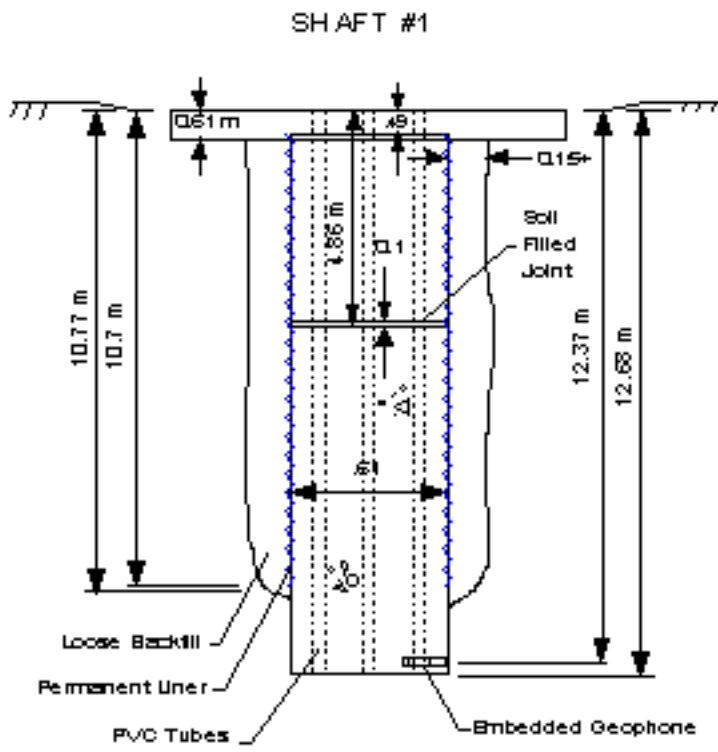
Detailed Schematic of Shaft 1 - Inaccessible-Head Condition
